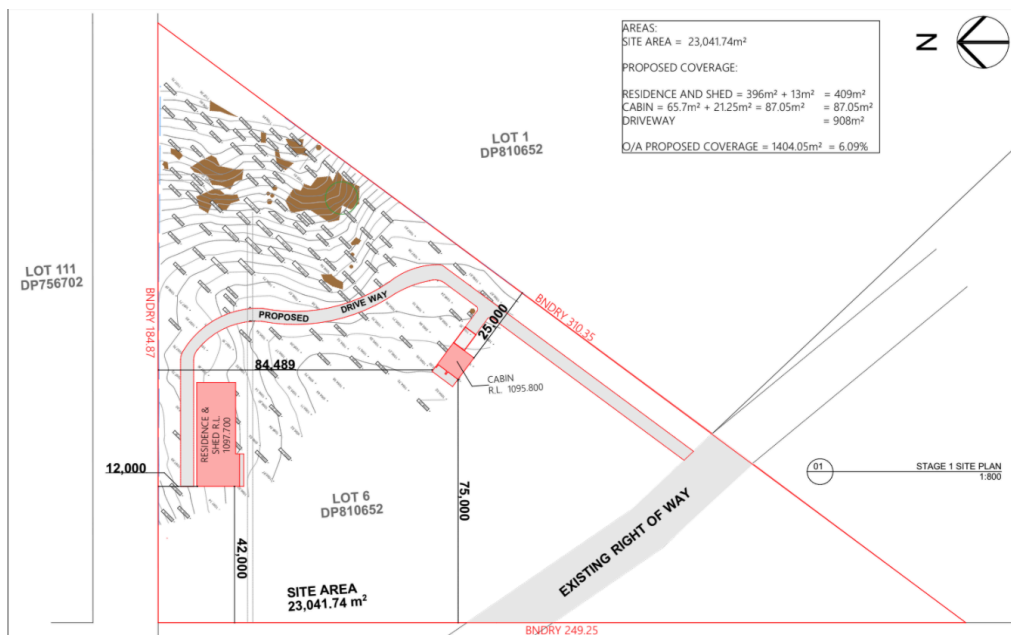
Proposed Stage 1 site plan; Source REST Joel Rosskelly Architect
